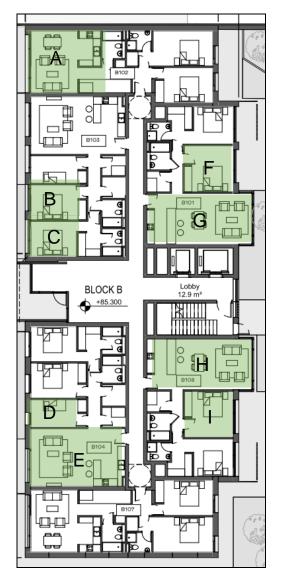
Level 1 Boulevard Ground Floor Block B Assessed Rooms (Source: HJL Drawing No. SFC-HJL-00-01-DR-A-1011)
